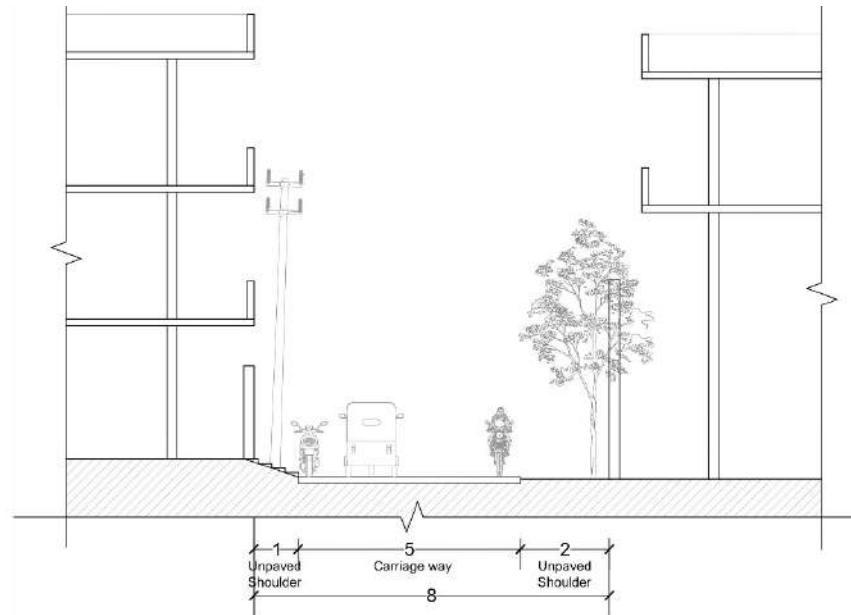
Road Cross Section: Vijayapuri Colony Road
